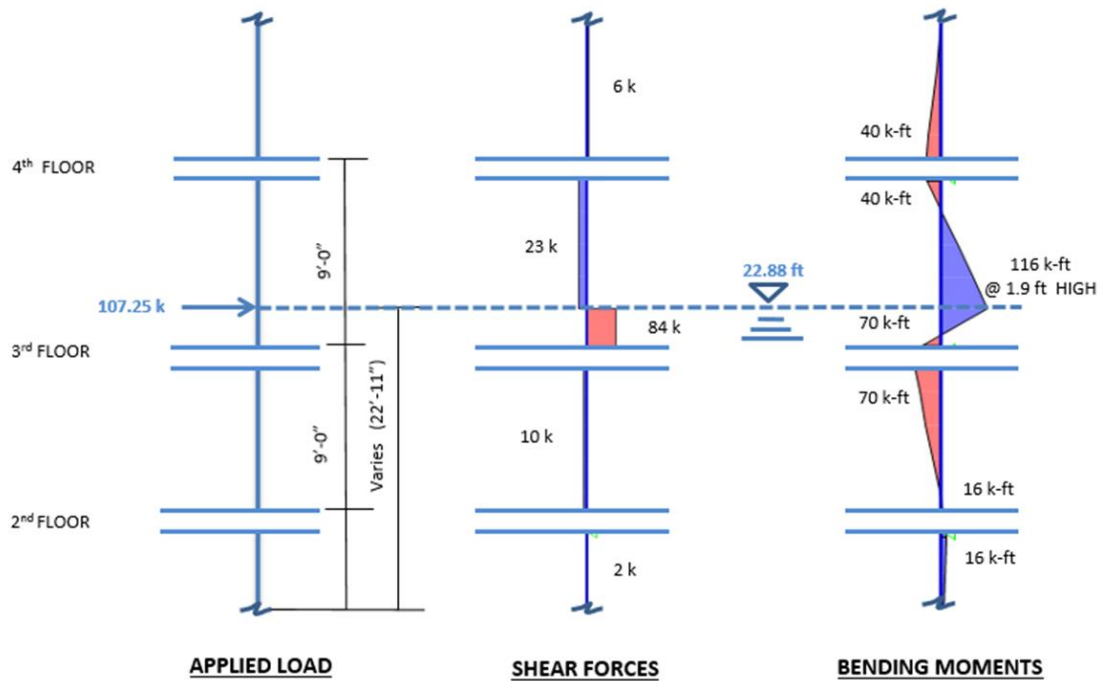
Impact load applied at 1.9 ft away instead of mid-height of assumed lateral restraint points at top and bottom of the 3rd floor column
